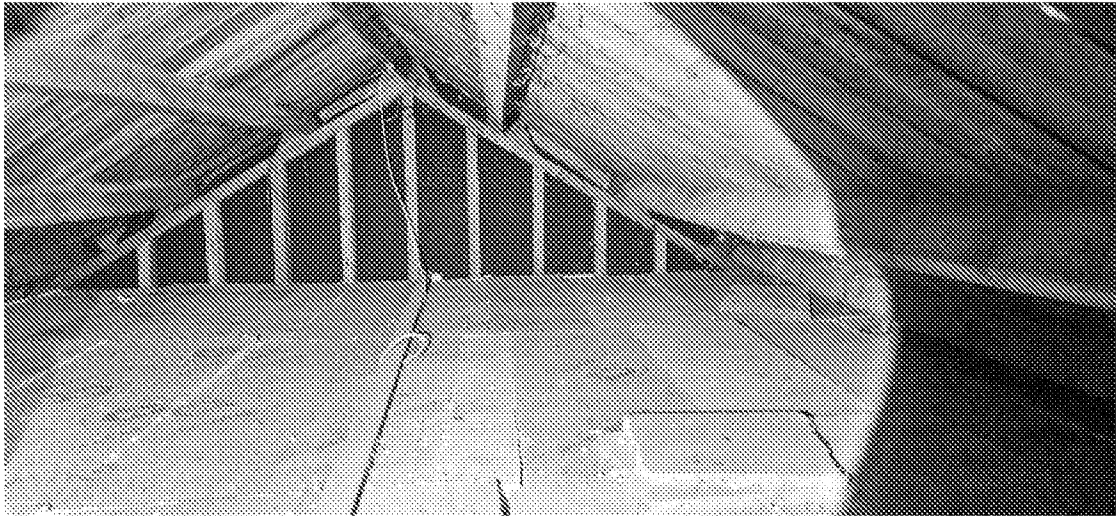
Internal loft void observing the southern end of the building (front gable)
